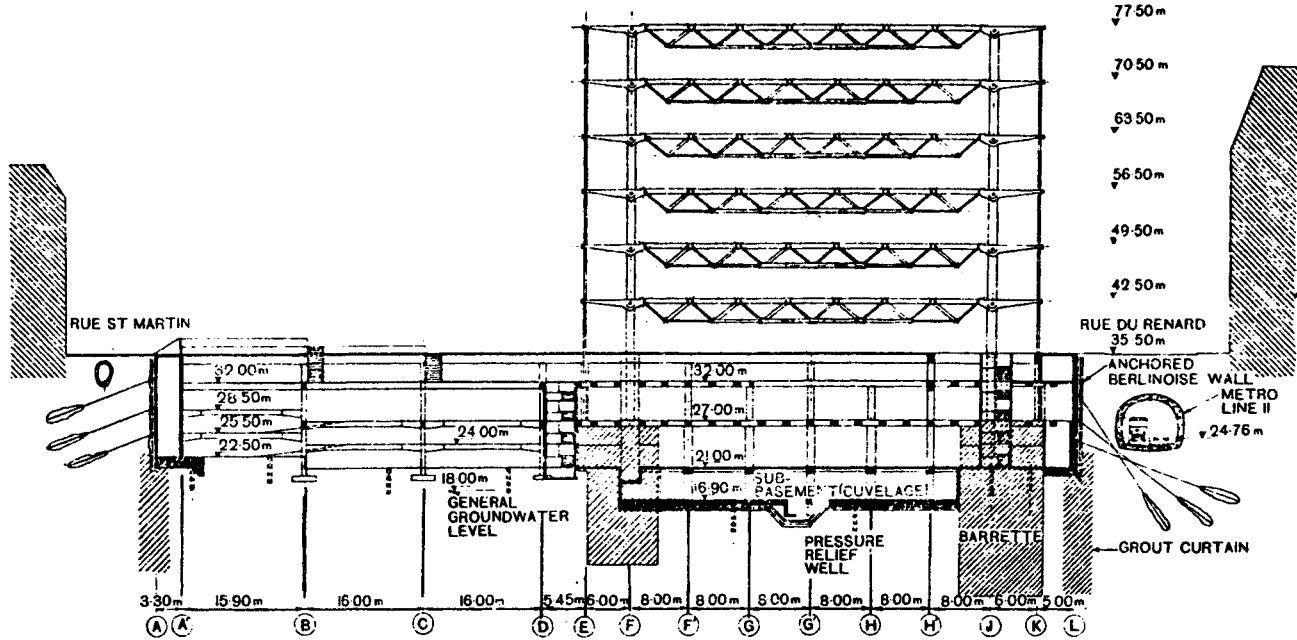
Section through building; Beaubourg Cultural Center, Paris. (From Corbett and Stroud, 1974.)
